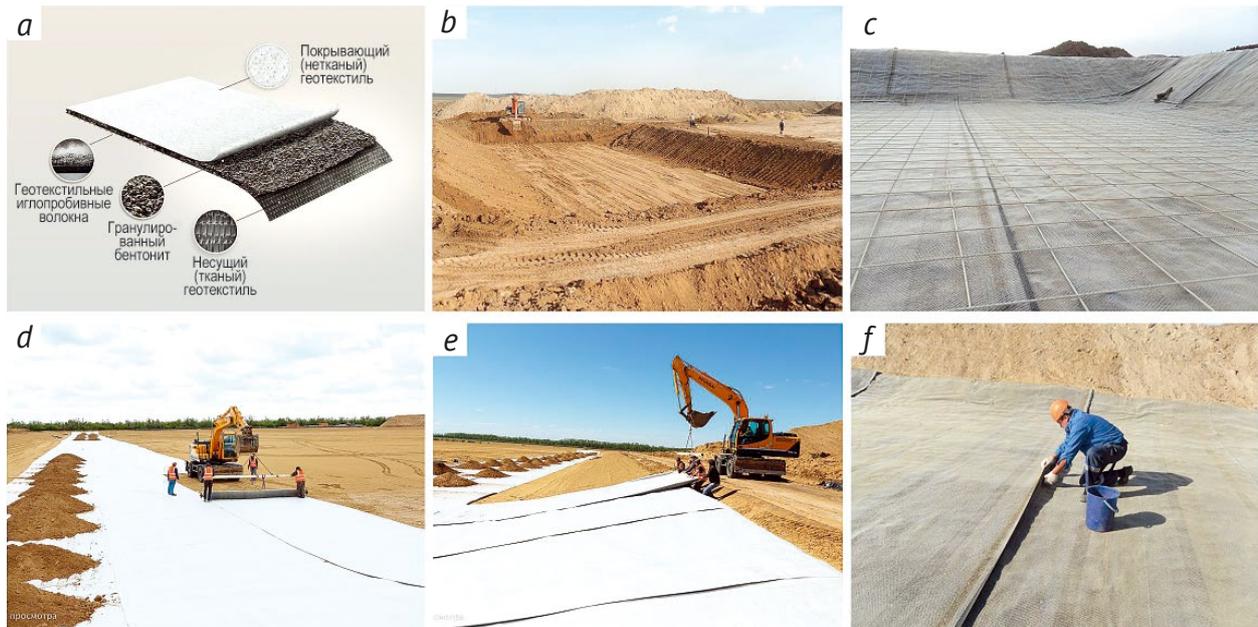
Layout of bentomat (a) examples of its application to ensure isolation of household waste landfills (before geotextile installation (b) after geotextile installation (c) examples of different layouts (d, e) and manual installation (f) during impervious barrier construction. Materials were presented by JSC Bentonite Company
